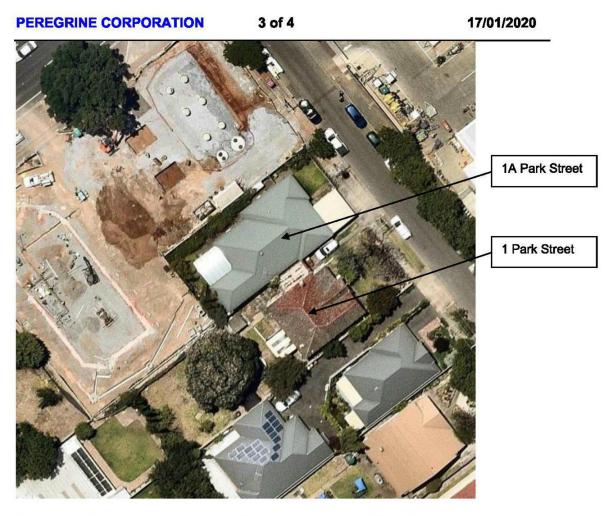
1A Park street constructed on the boundary abutting 1 Park Street
